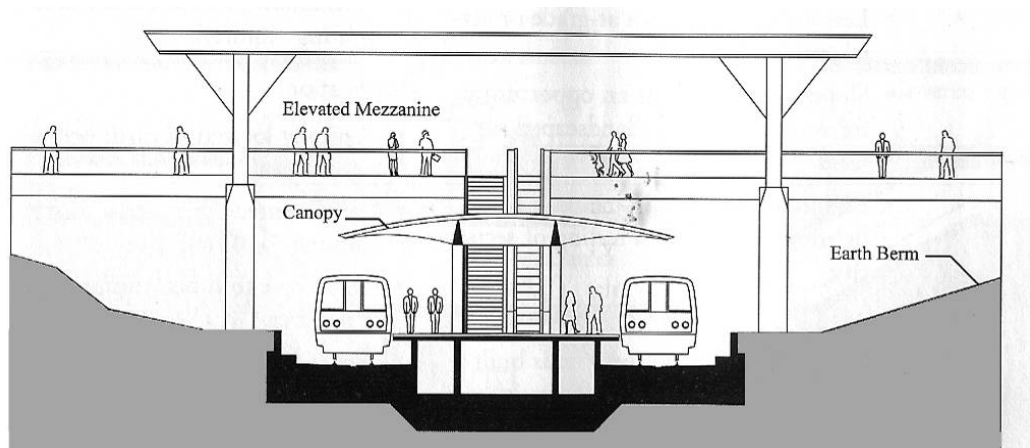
At-Grade Tracks Built with Bridge Overpass Access
